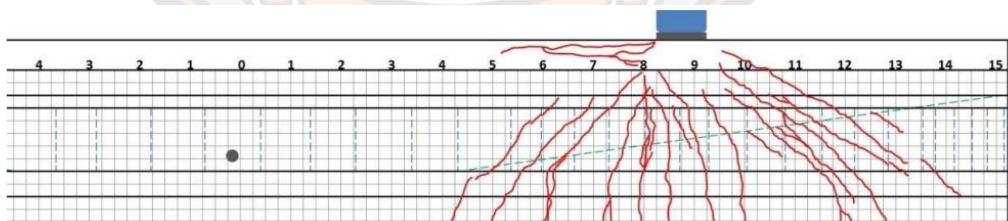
Shear test A2 cracking; strand rupture occurred at the 8 ft mark [34]
